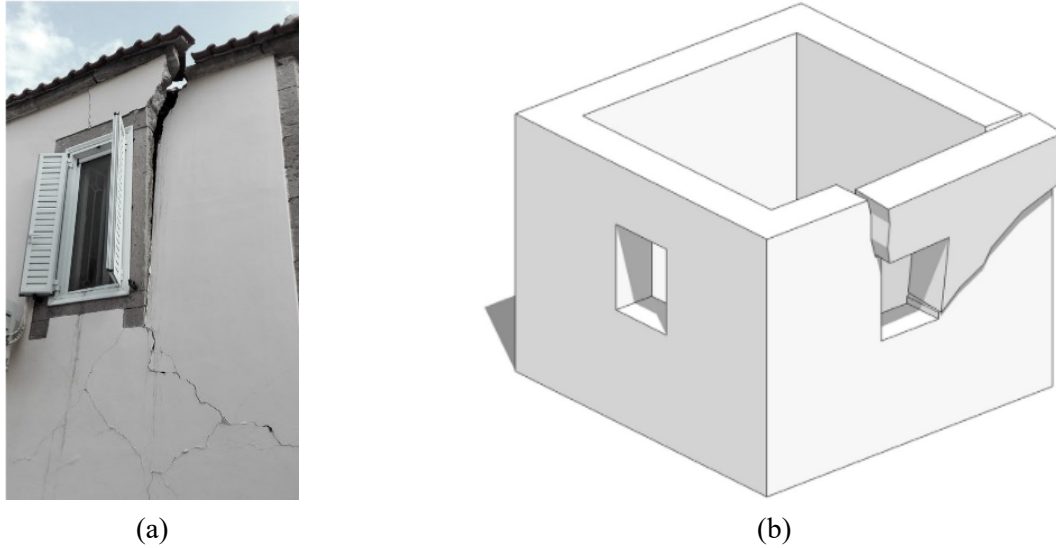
Out-of-plane collapse of in-plane damaged masonry walls: (a) field observation, and (b) corresponding schematic sketch (Vlachakis et al. 2020)
